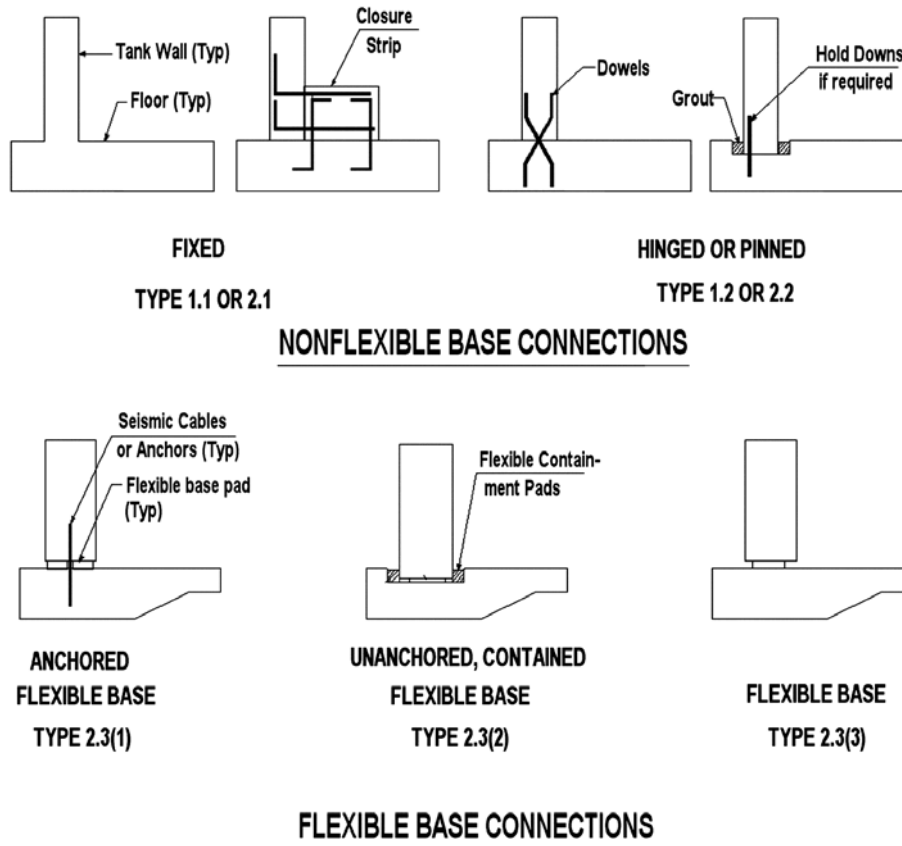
Types of ground-supported, liquid-containing structures classified on the basis of their wall-to-footing connection (after [1]).
